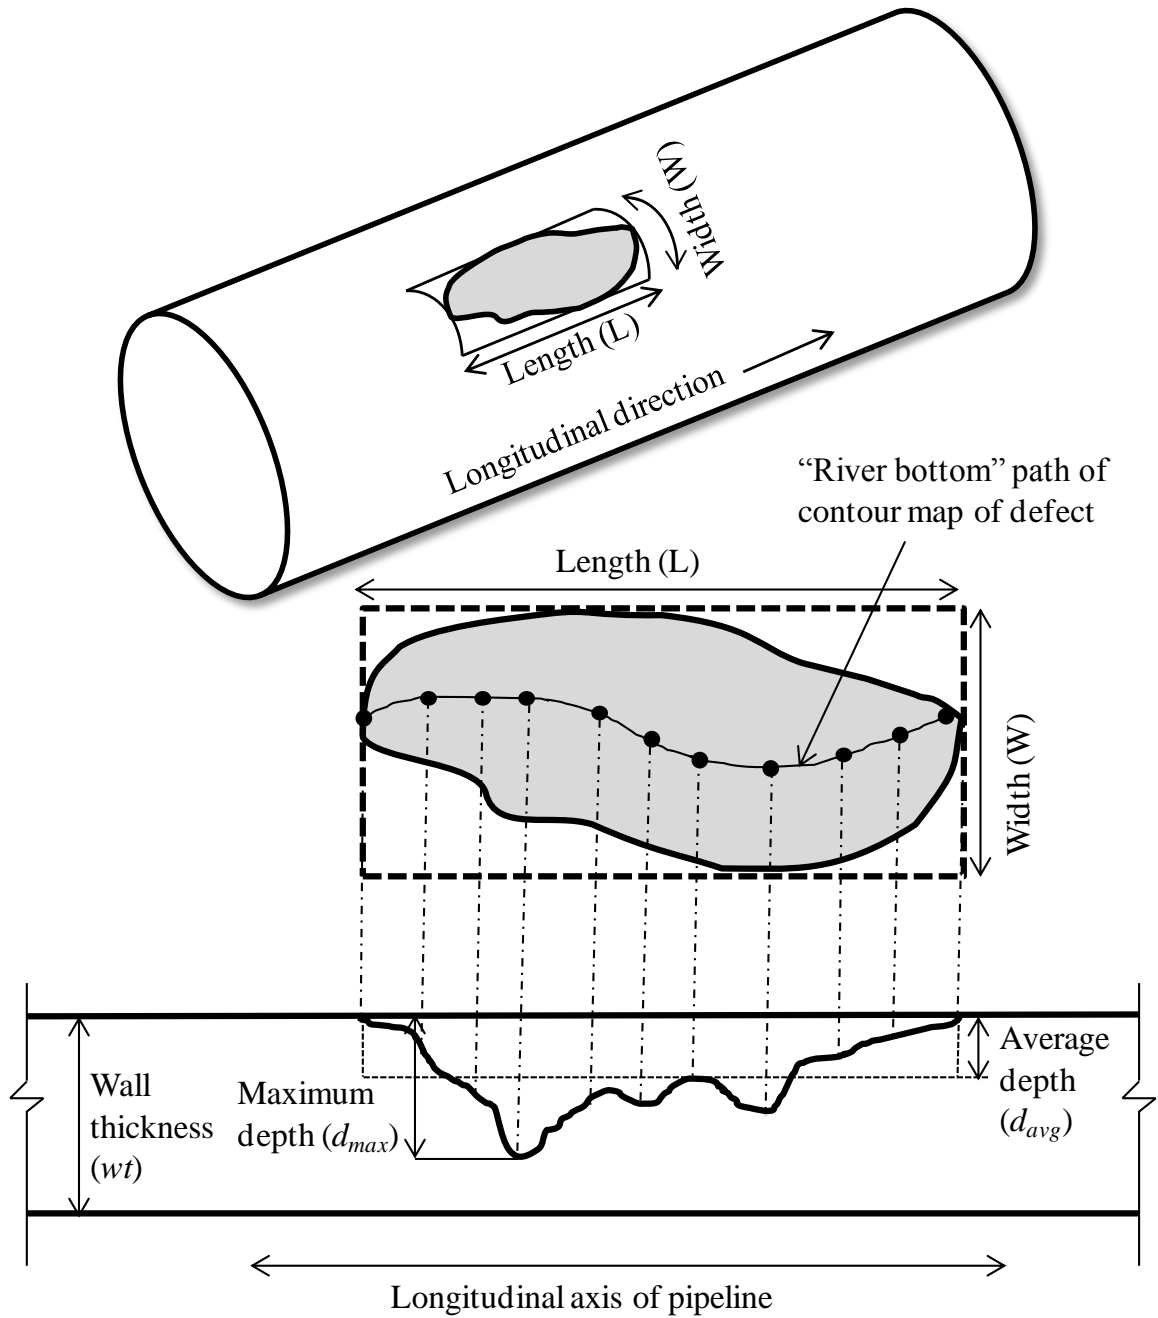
Dimensions of a typical corrosion defect on pipeline
